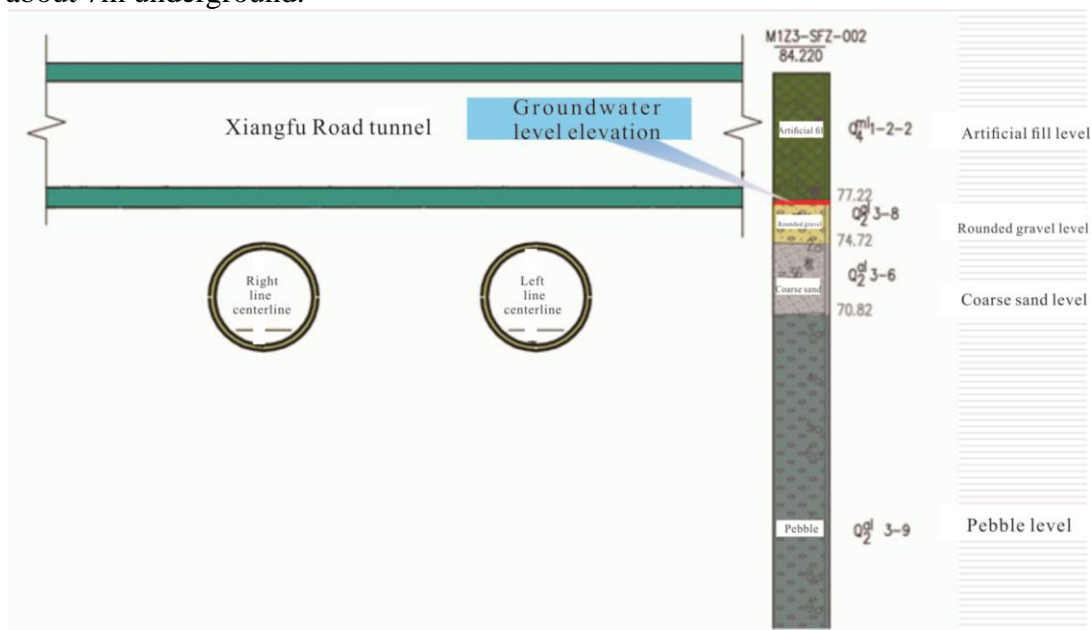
Geological profile of Xiangfu Road Tunnel and planned Subway Tunnel
